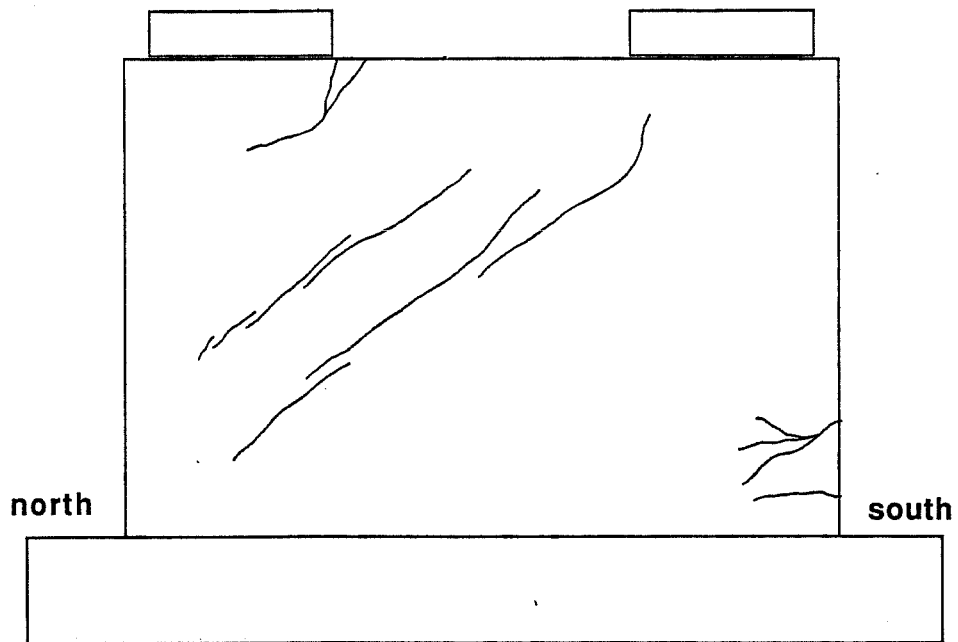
Crack Pattern at 150 kips (Loading North)
